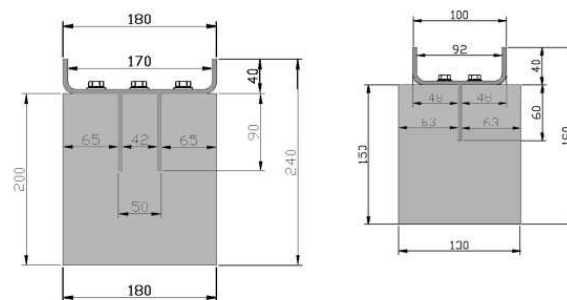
Steel cross-section reinforcement in timber sections of 180x200 mm and 130x150 mm (45).
